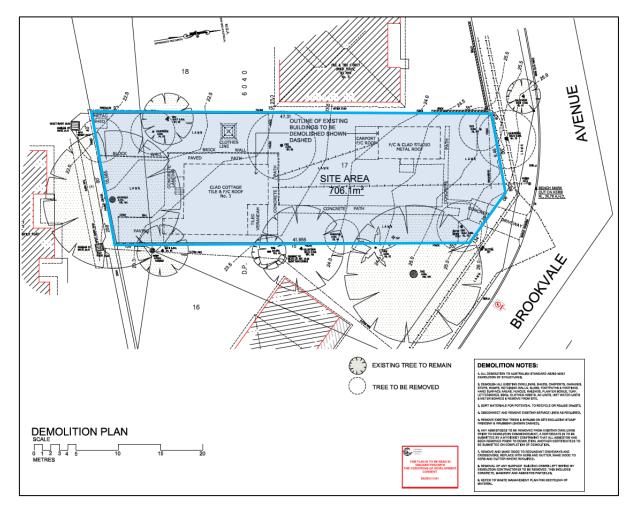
Proposed demolition plan (Source: Barry Rush and Associates)
